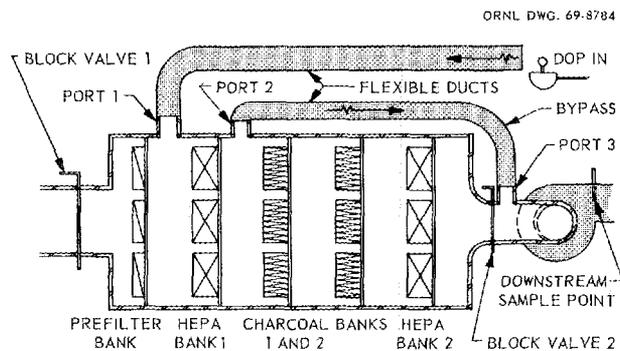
Set-up for in-place testing of HEPA filter system when DOP is introduced directly into filter housing. System rigged to test HEPA bank 1. To test HEPA bank 2, the bypass is removed, ports 1 and 3 are closed, the DOP intake duct is connected to port 2, and block-valve 2 is opened. Upstream samples are taken from the housing immediately ahead of the bank of filters being tested.
